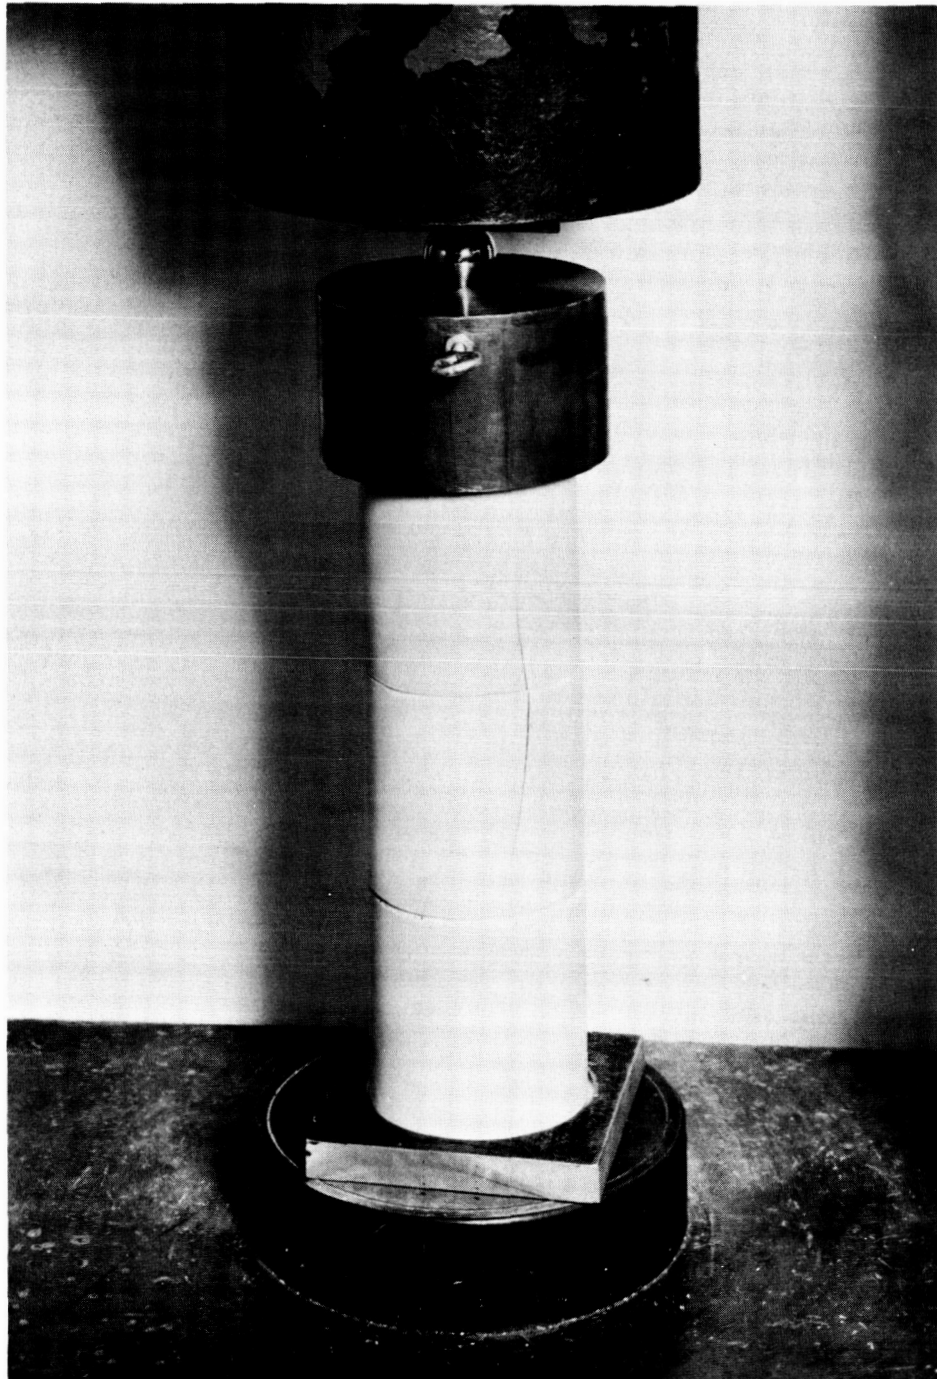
CYLINDRICAL SEGMENTED COLUMN WITH LONGITUDINAL
